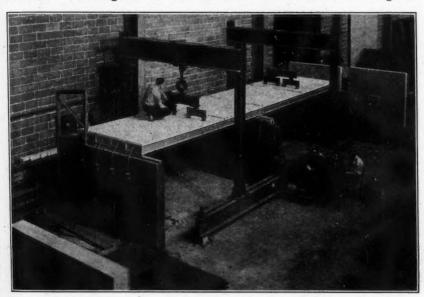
View of Two-Span Continuous I-Beam Bridge
